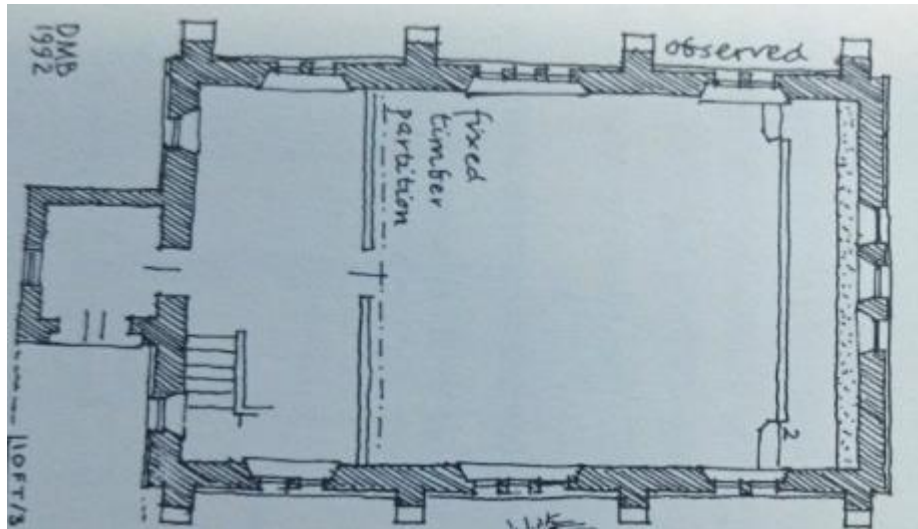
Ground floor plan of the meeting house as reconstructed by Butler (north at the top; not to scale) (Butler (1999), vol. 1, p.48)
